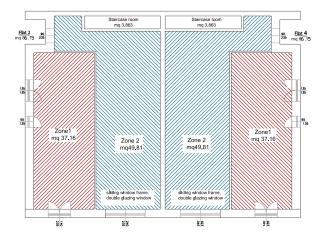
Three thermal zones in which the ground and first floor of the Leaf House are divided to
